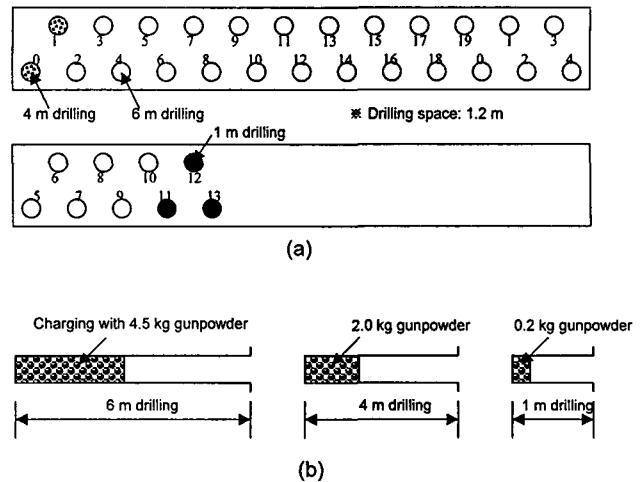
Drilling drawings (a) and crosssection of drilled hole charging with gunpowder (b) used in the test blasting.
